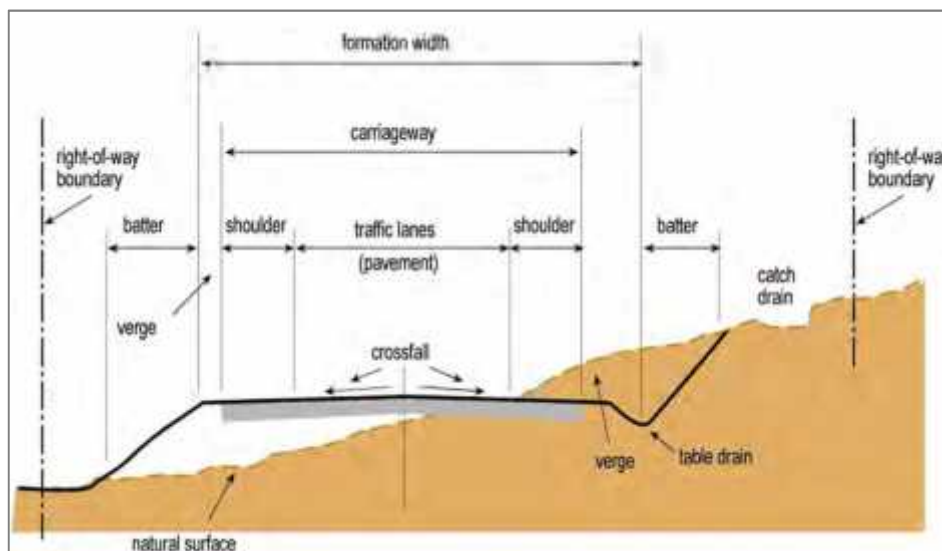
Road Cross Section Elements (Source Austroads 1989)
